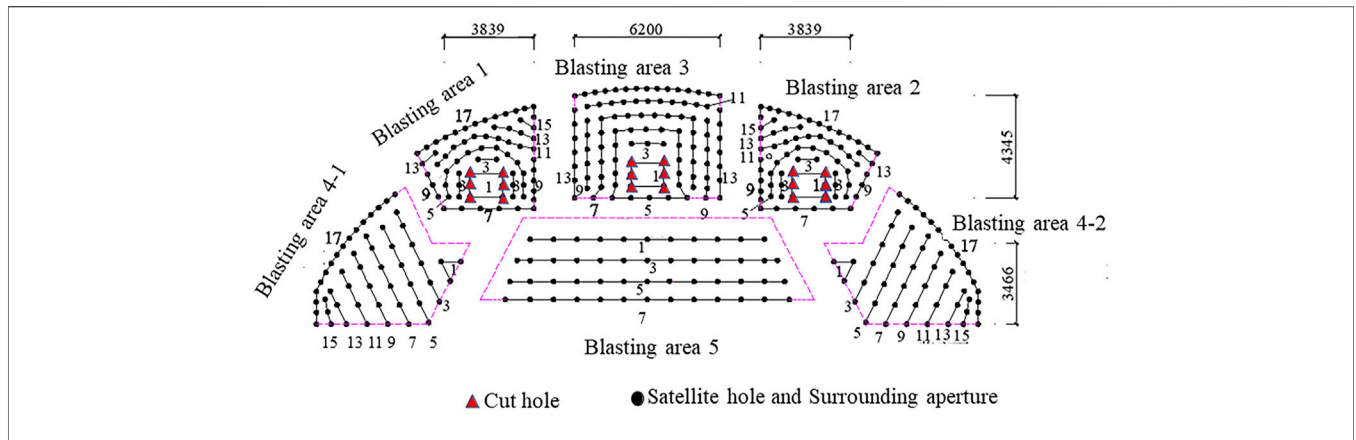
| Blasting hole layout of the station hall floor (unit: mm).
